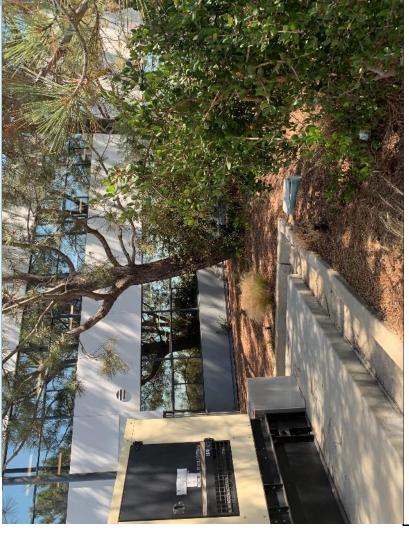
Photograph of the eastern side of the existing buildings. Photograph taken facing south. Note the existing pine trees located adjacent to the buildings at the top of slope.
